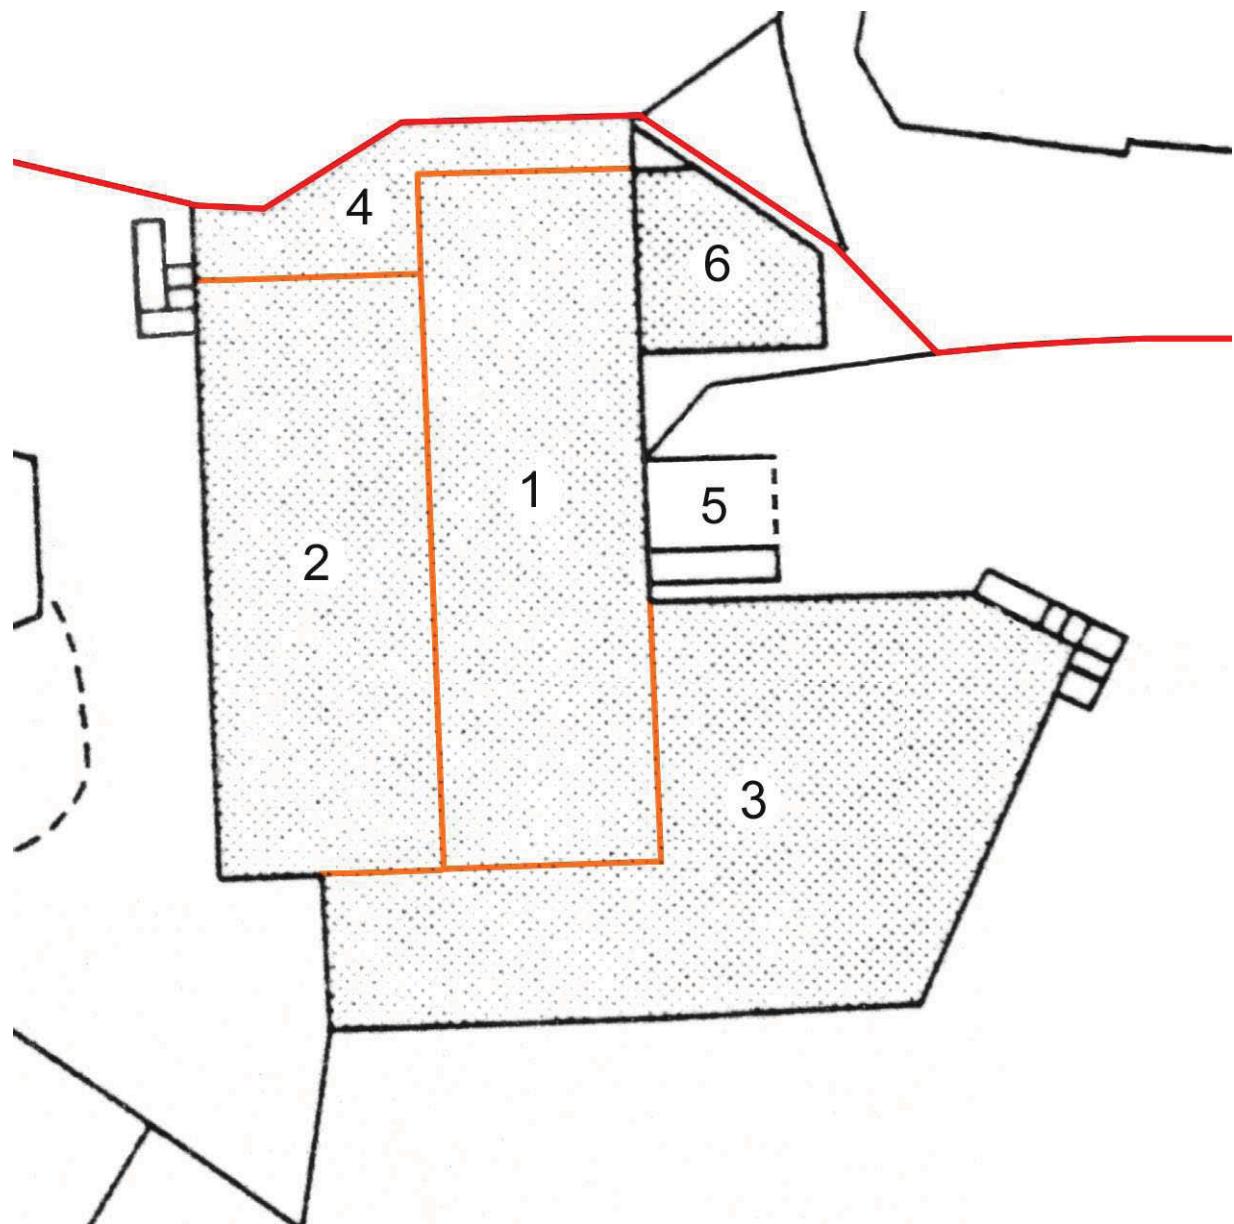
Plan showing the separate building elements (1-6) within the pre-development Grove Mill
